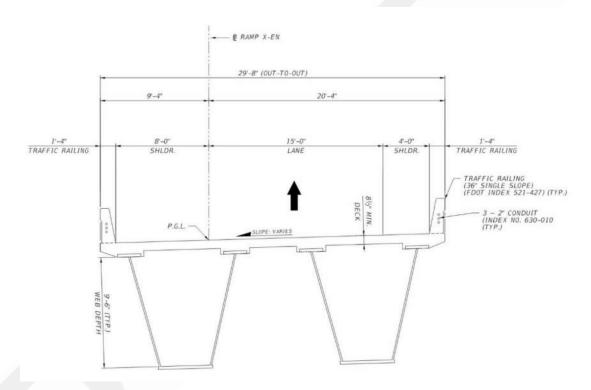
Bridge Typical Section (Bridge No. 3)
